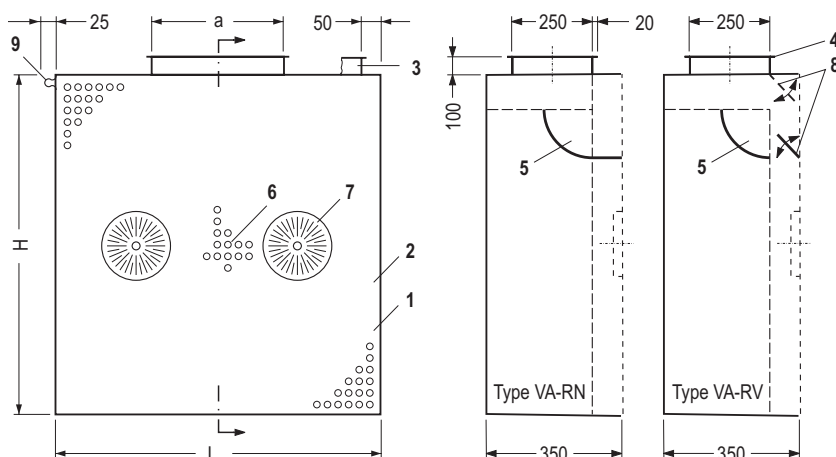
Rectangular displacement outlet, standard sizes with measurements and weights
